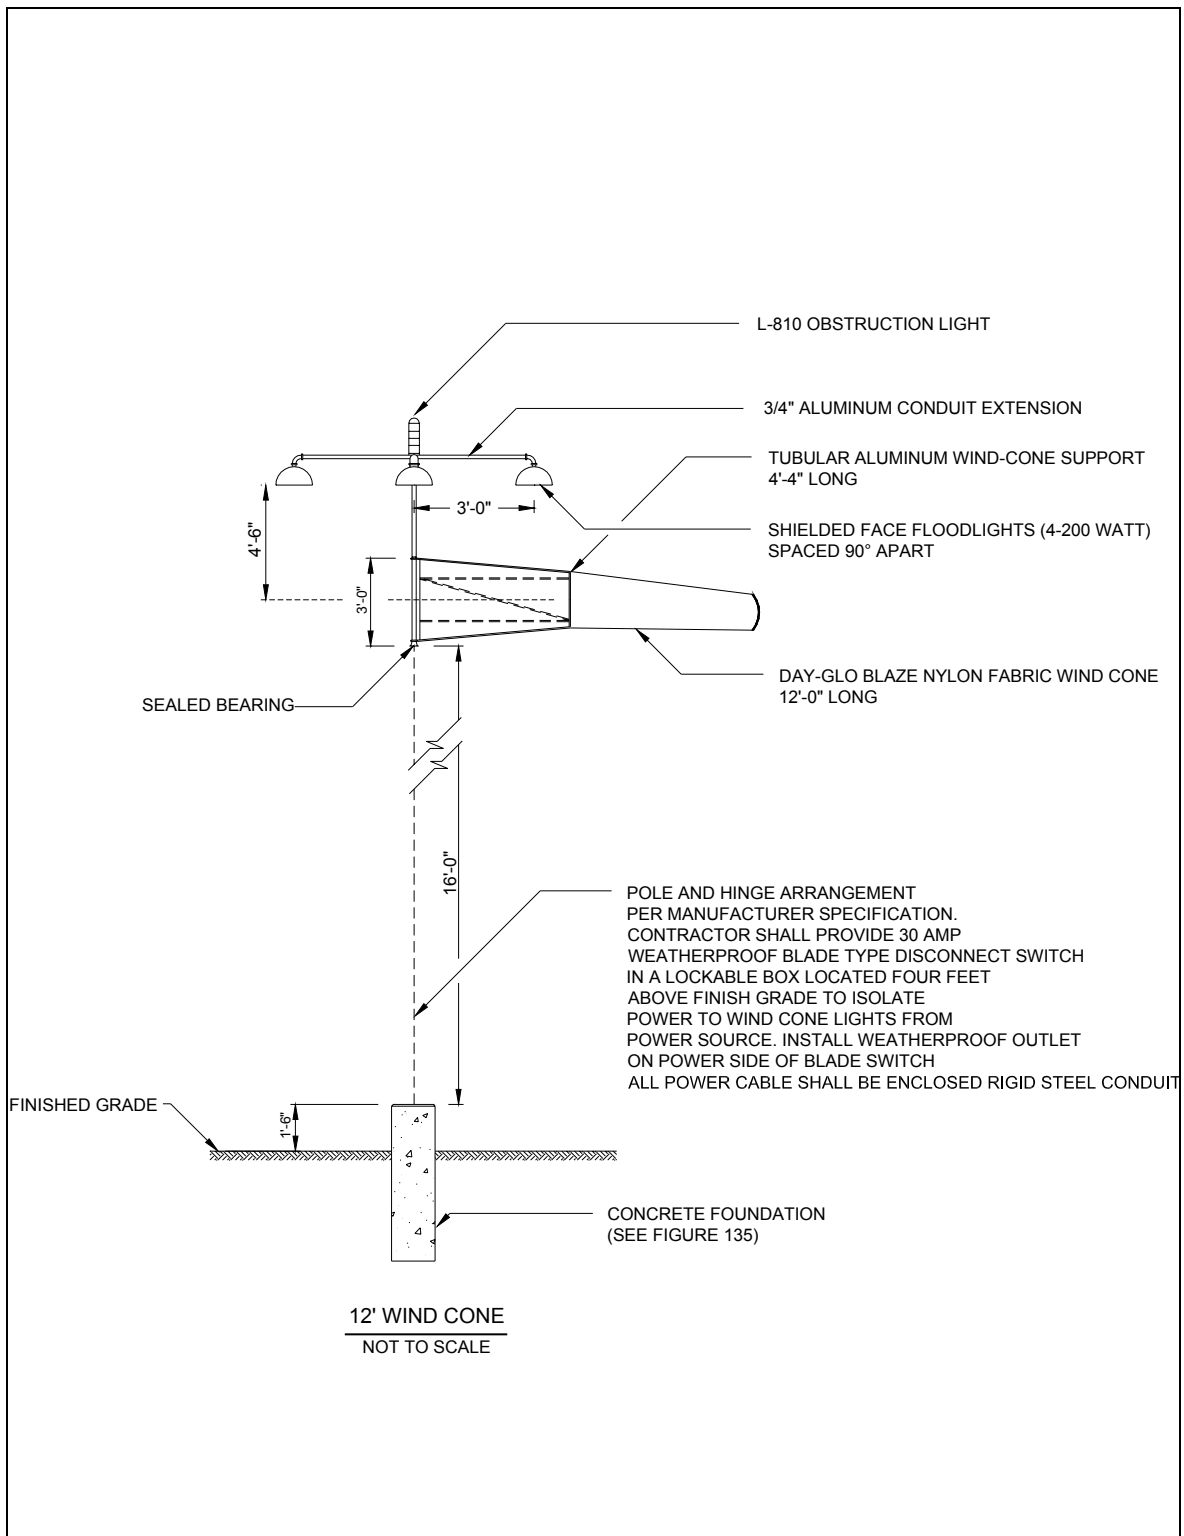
Standard Details for Wind Cone – GL-600 Sheet 5B – 12' Wind Cone
